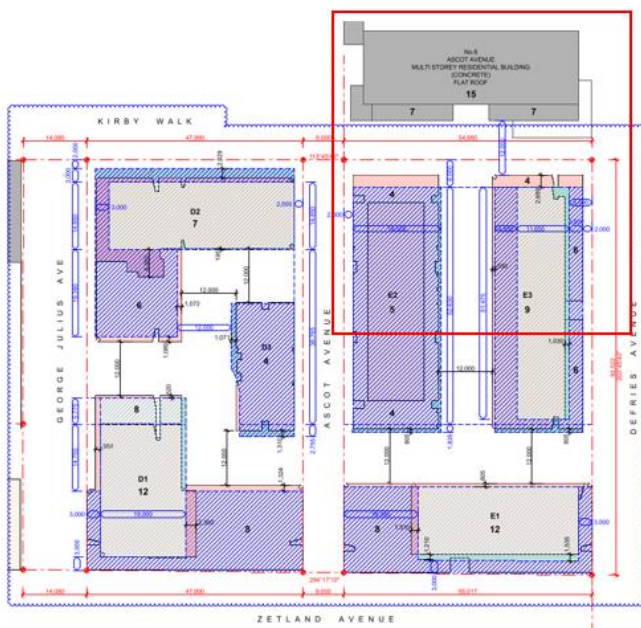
Site Plan of Building groups D and E, showing 8 Ascot Avenue north of Buildings E2 and E3
